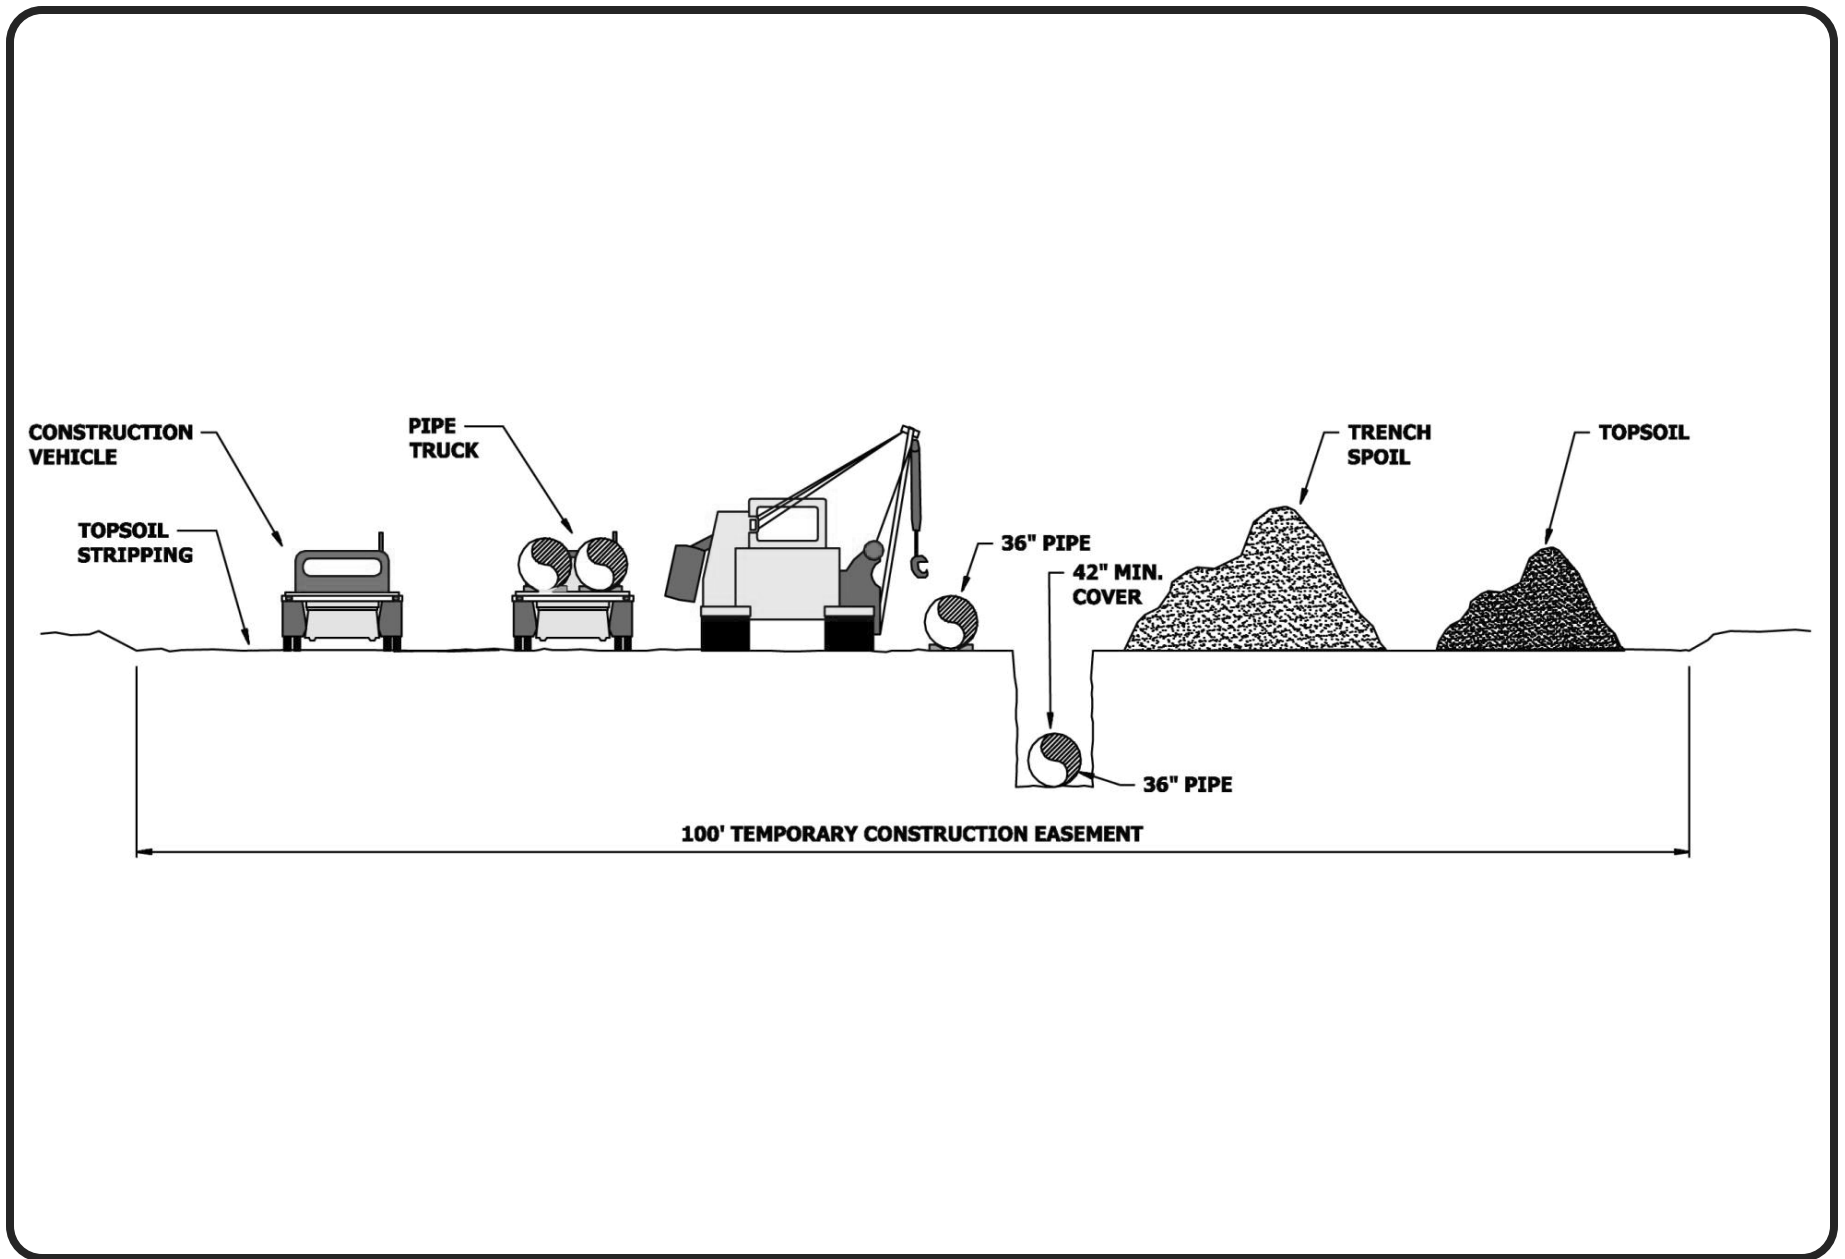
Typical Cross-Country ROW Cross-Section
